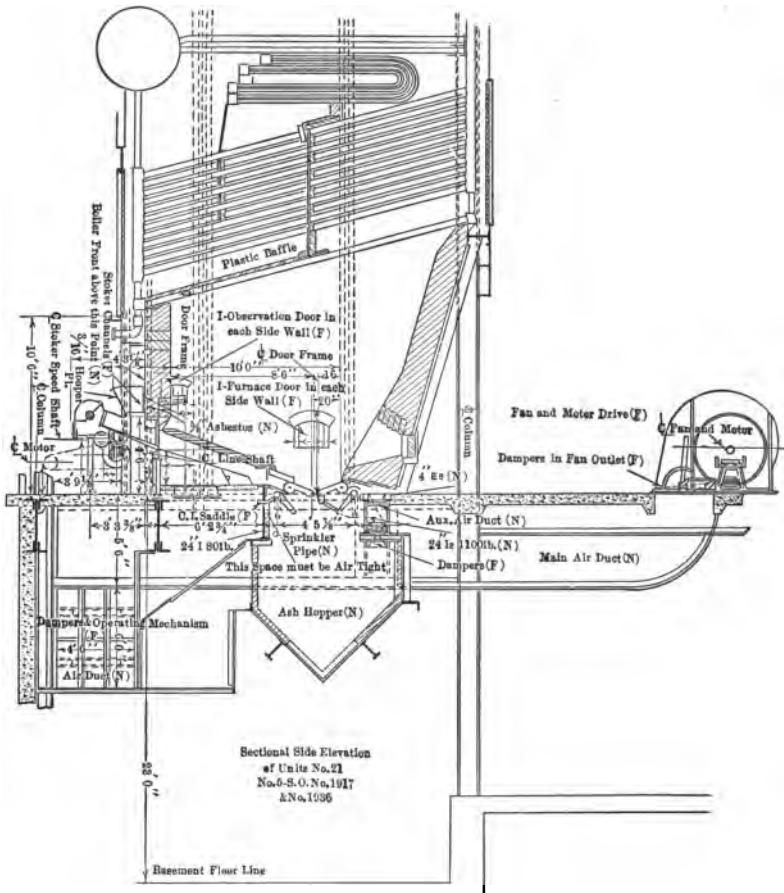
Stoker and Boiler Setting American Gas & Electric Co.
